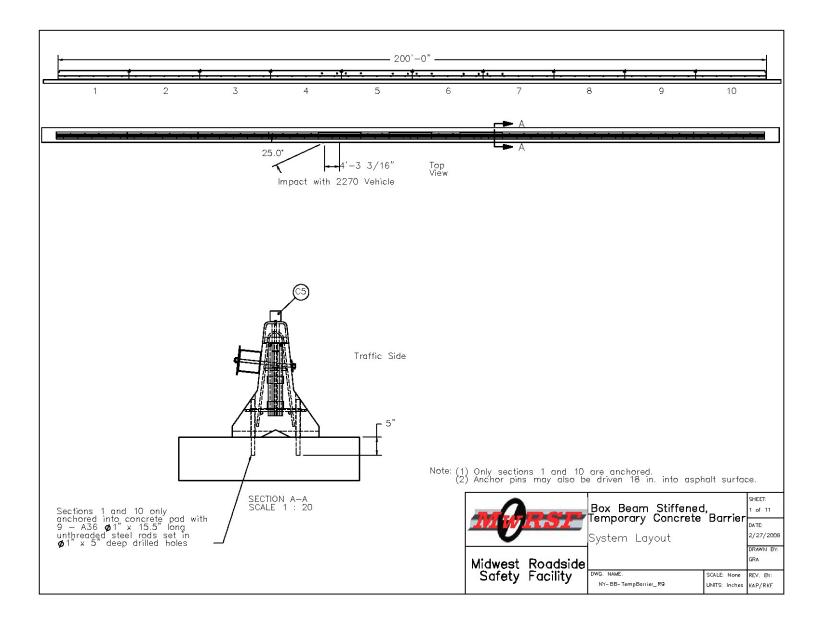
Stiffened Temporary Concrete Barrier System Layout (English), Test NYTCB-1
